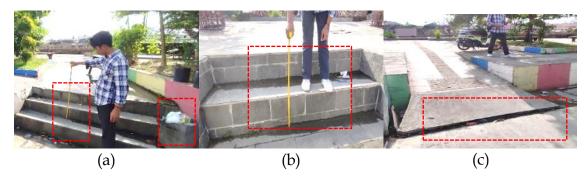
Stairs and Ramps. (a-b) Park Steps, (c) Park Ramps
